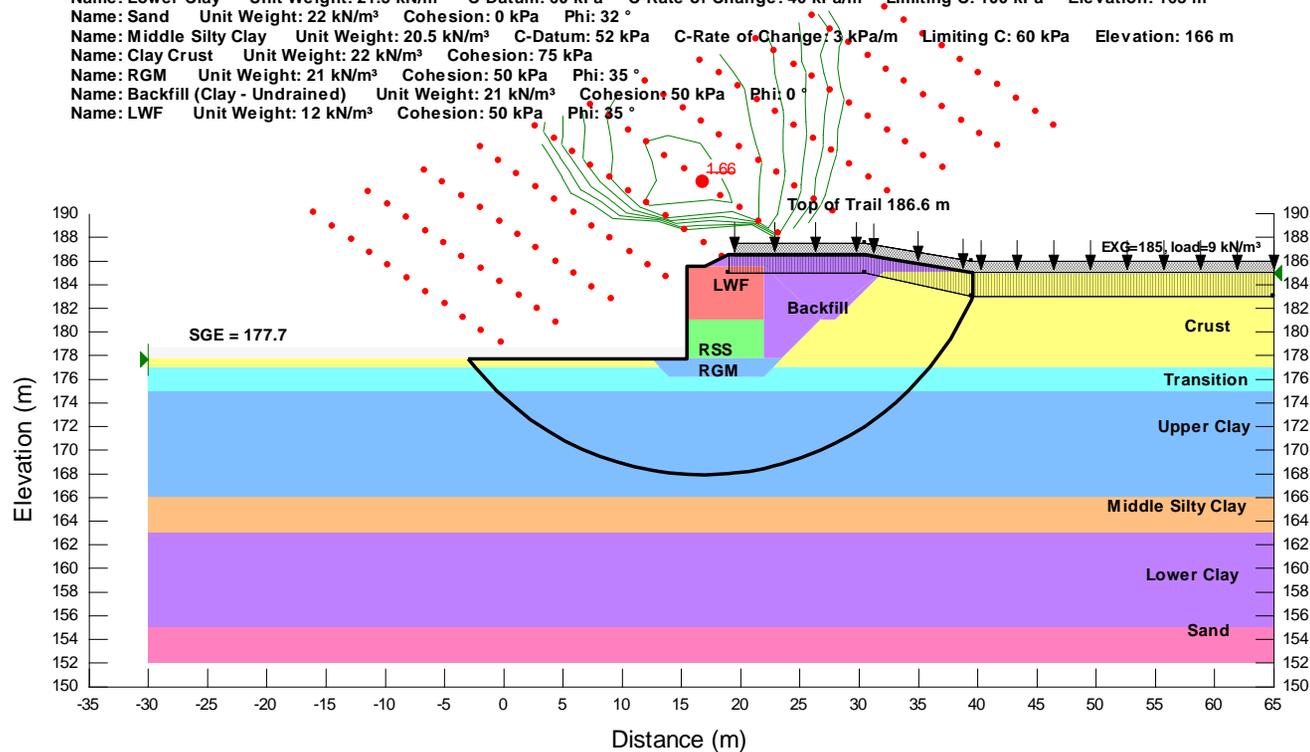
Global Stability Result - Wing Wall Southeast - End of Construction Loading (Undrained properties)
